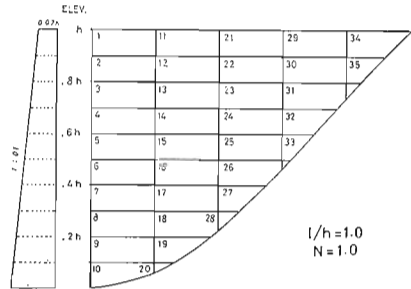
Developed view of elevation and cross-section of crown cantilever.
